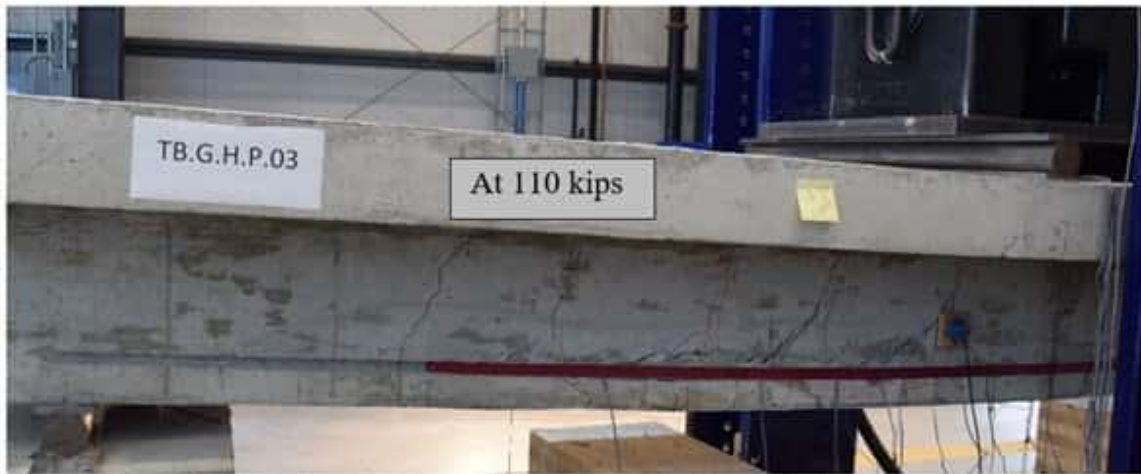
Concrete-epoxy interface failure for Specimen TB.G.H.P.03
